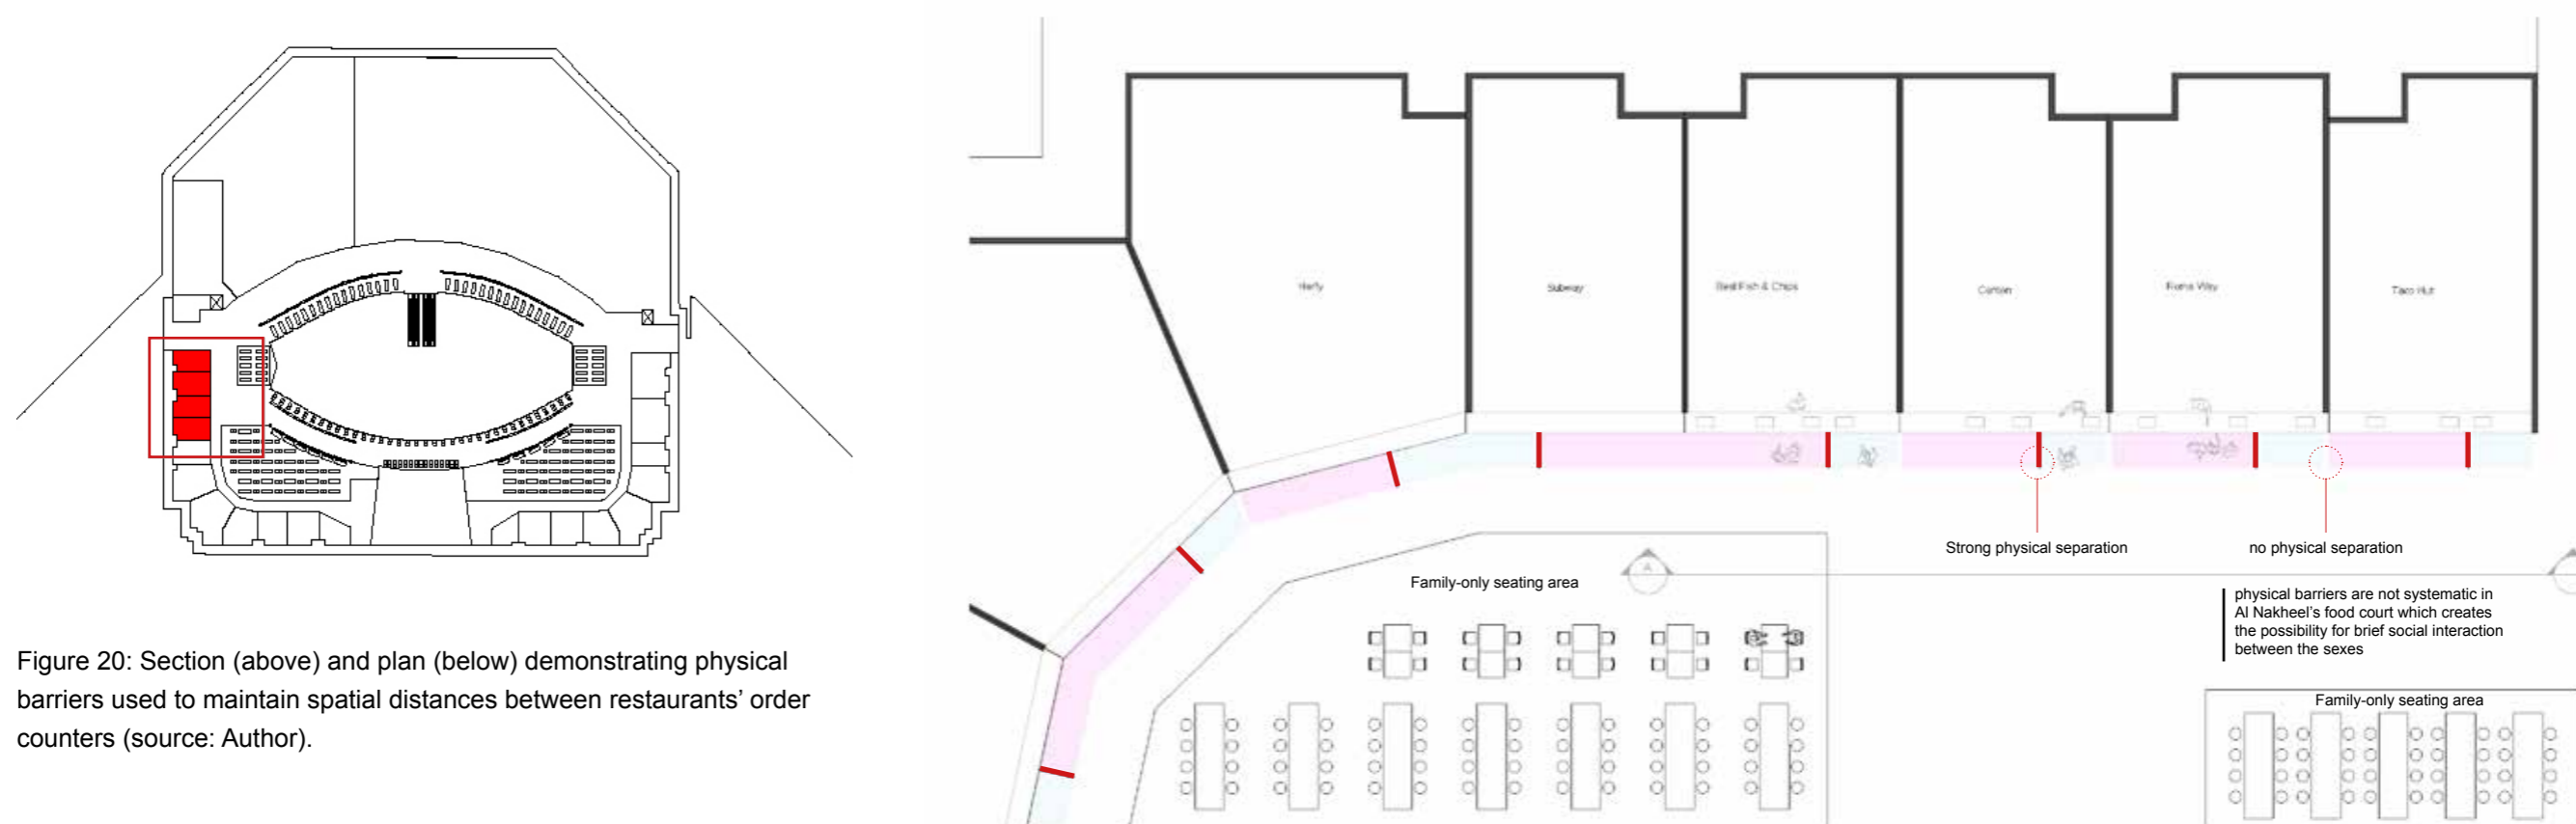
Section (above) and plan (below) demonstrating physical barriers used to maintain spatial distances between restaurants' order counters (source: Author).
